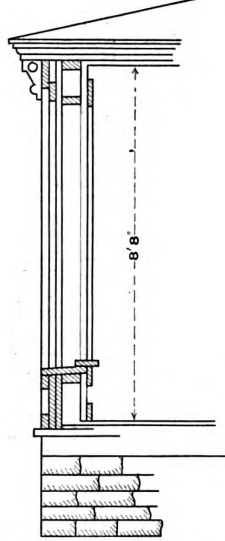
Vertical Section of Bay Window, Showing General Construction.—Scale,  $\frac{1}{4}$  Inch to the Foot.
